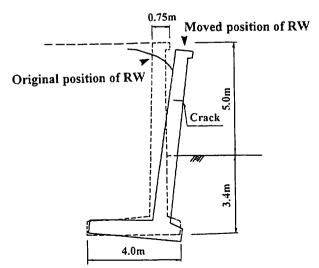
Damage to cantilever-type RC RW; embankment for Main Line of Hanshin Railway Co. adjacent to Ishiyagawa Station (Site CL4 in Fig. 2)
